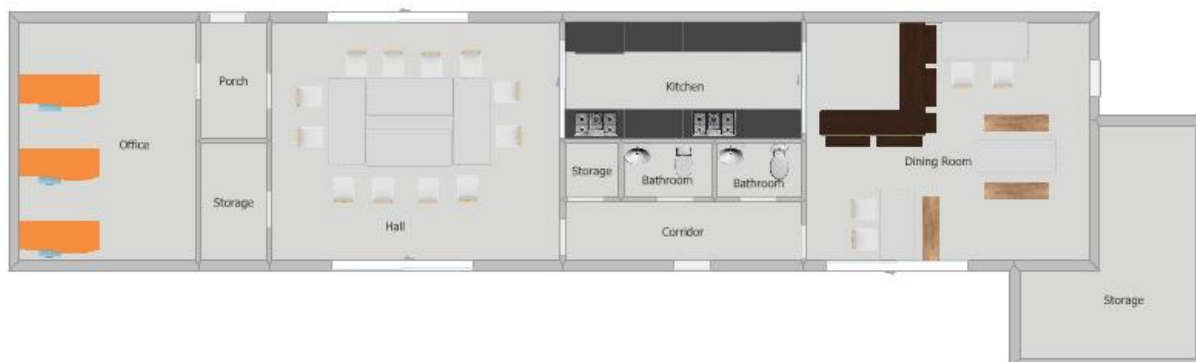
Layout of the Squash building, with communal seating and open kitchen space, accessible from two eating spaces (Credit: Author)
